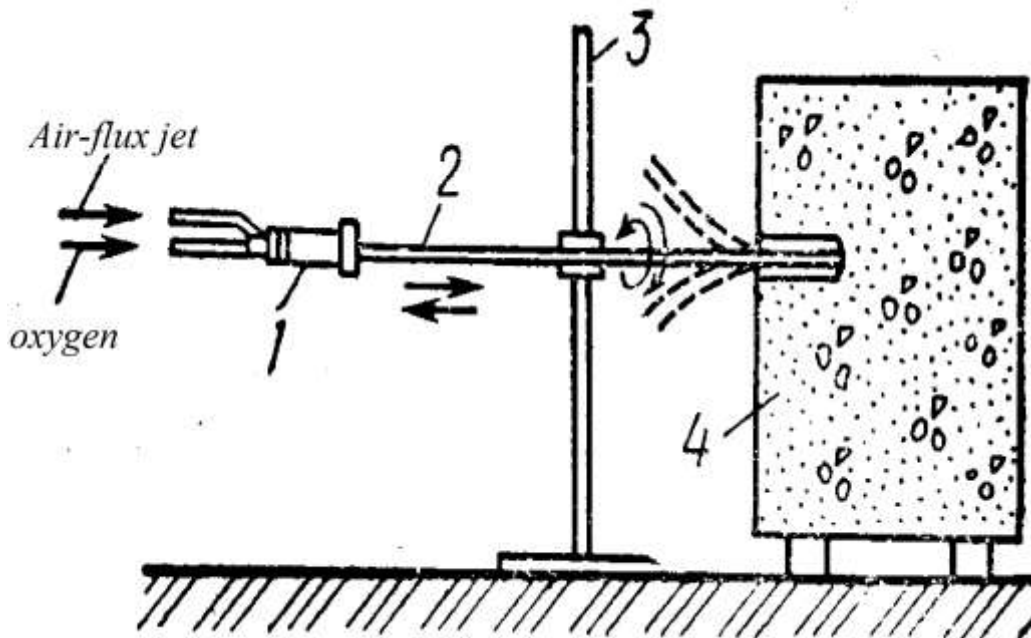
Scheme of burning a hole in concrete with an oxygen spear:
